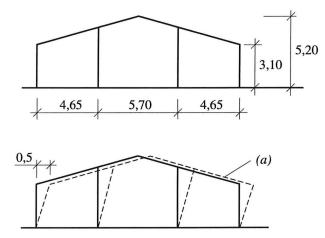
The frame structure and the deformation of the frame; (a) deformed frame.
